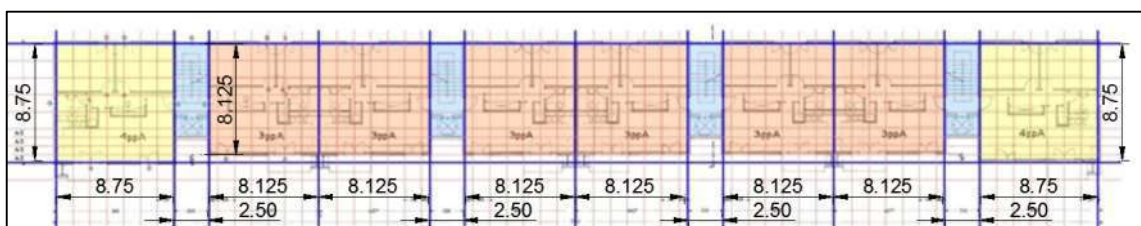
Typical floor Plan. Dimensions of the 2 different sized boxes.
